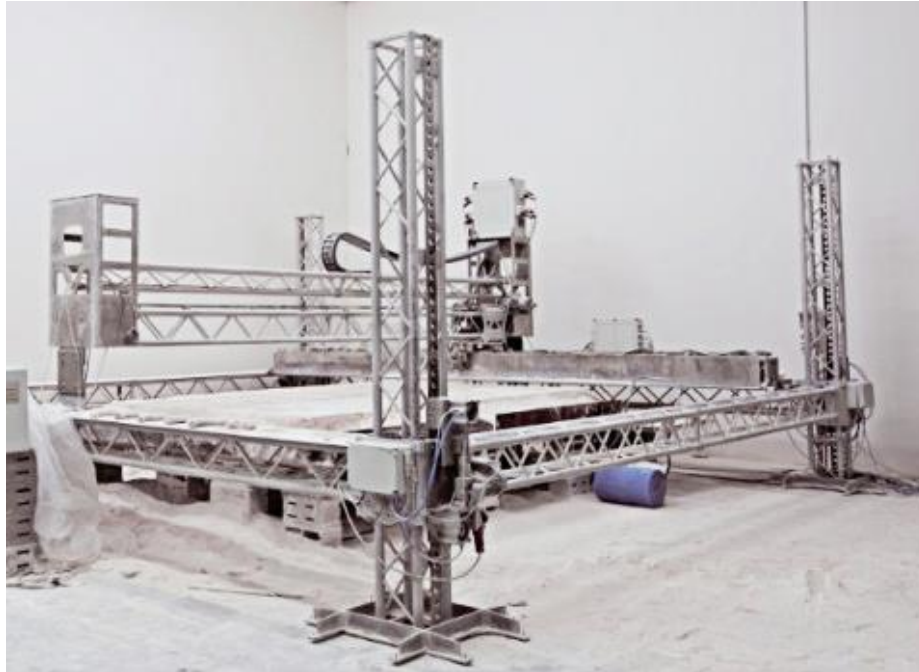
, D-Shape machine for construction purposes (Dini, 2006)
